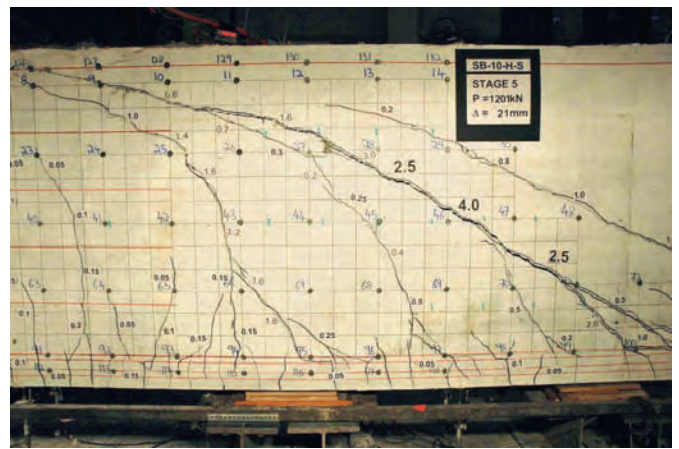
Failure of 1.5 m thick slab strip with minimum shear reinforcement.
